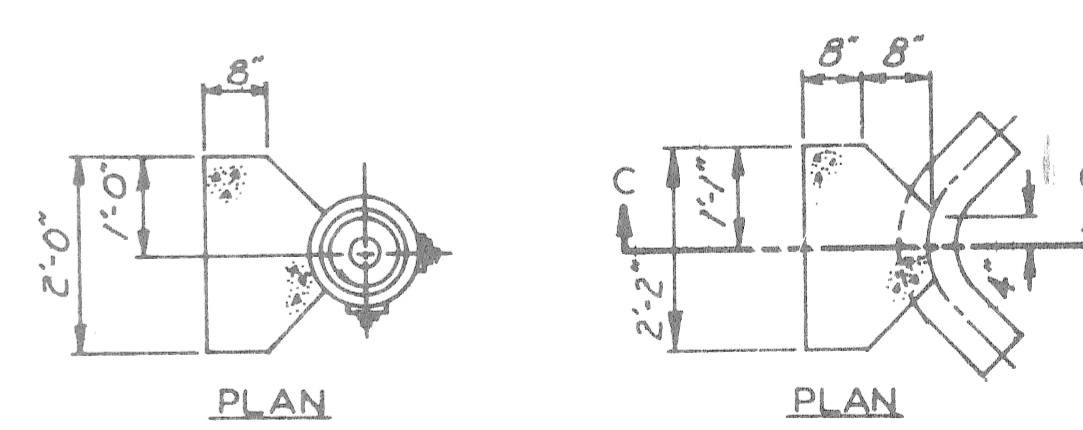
" HYDRANT INSTALLATION STRAIGHT AWAY
